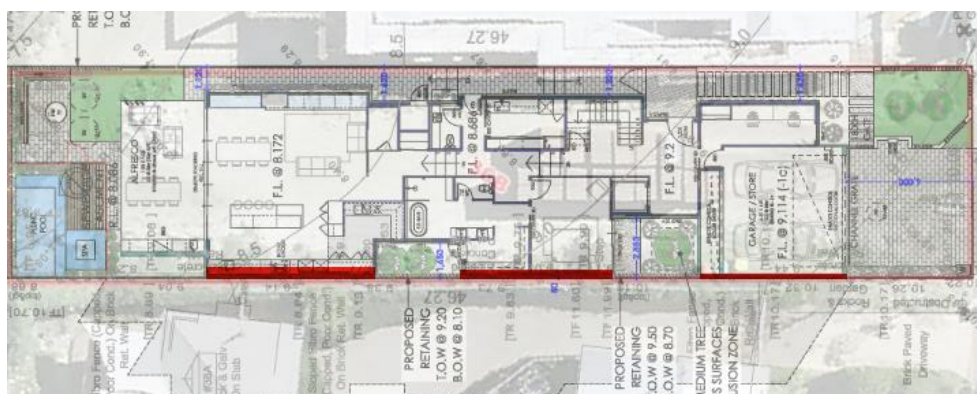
Site plan of the subject site with the boundary walls highlighted in red.
